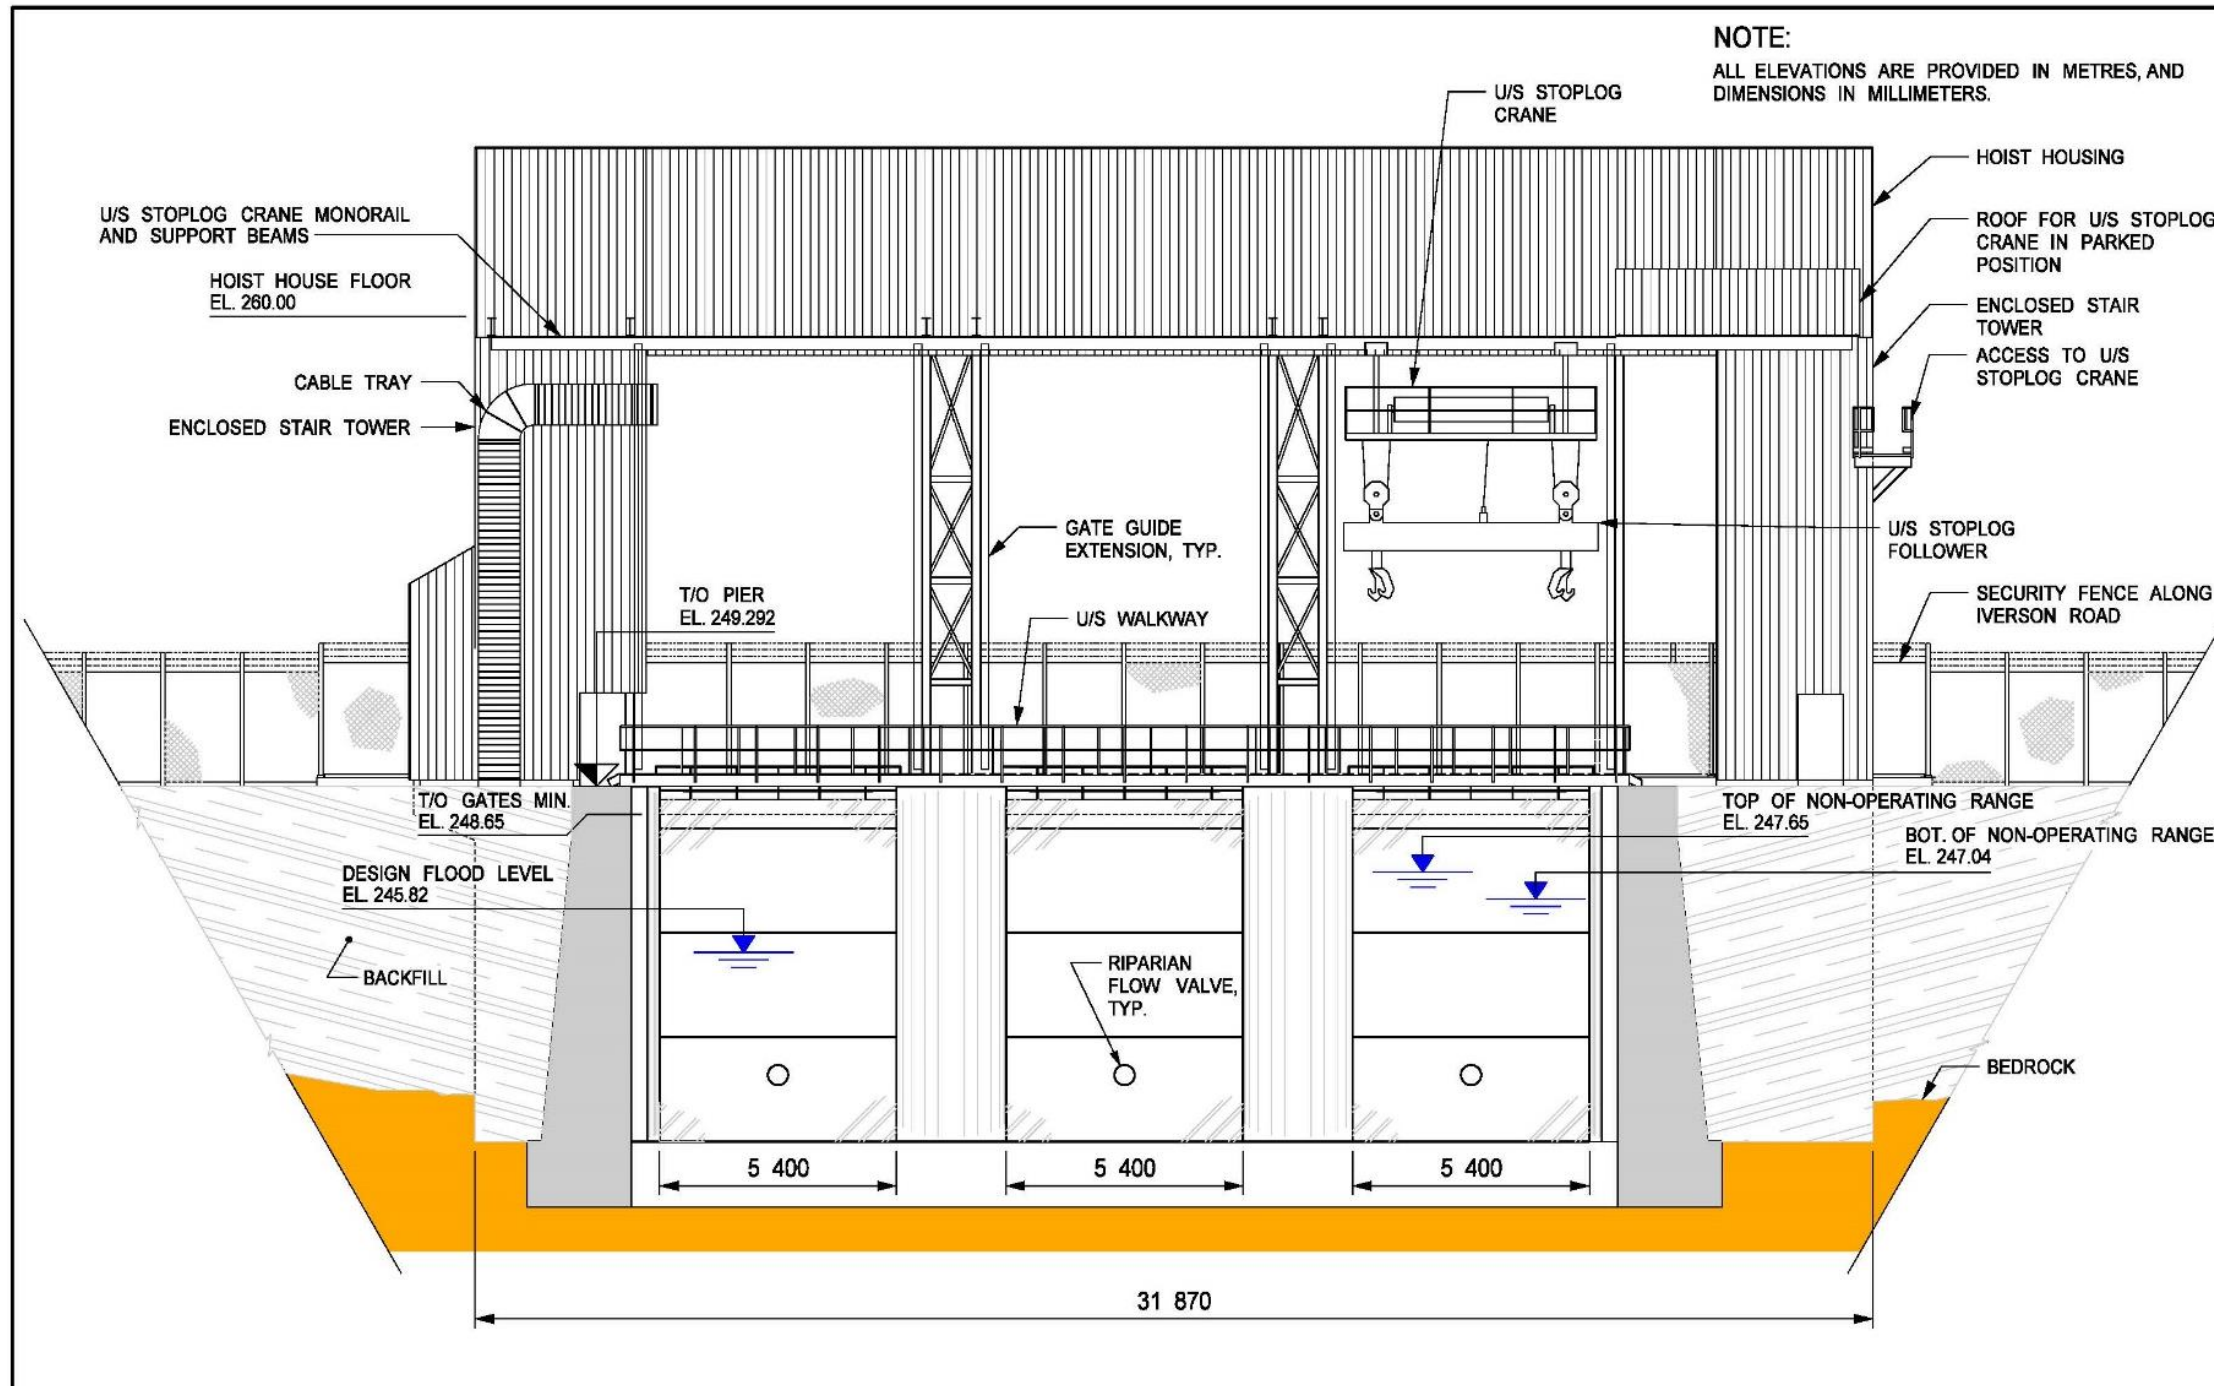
C-11c LMO Water Control Structure - Section Through Centerline
